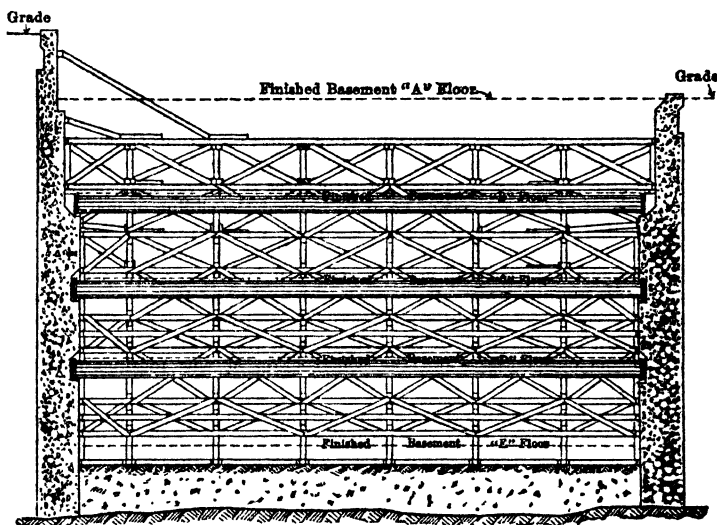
Temporary and Permanent Cross-Lot Bracing
